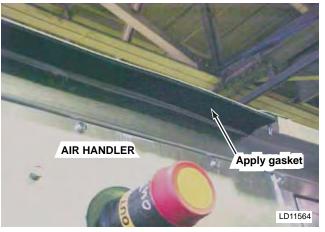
INSTALL GASKET UNDER ROOF OVERHANG
